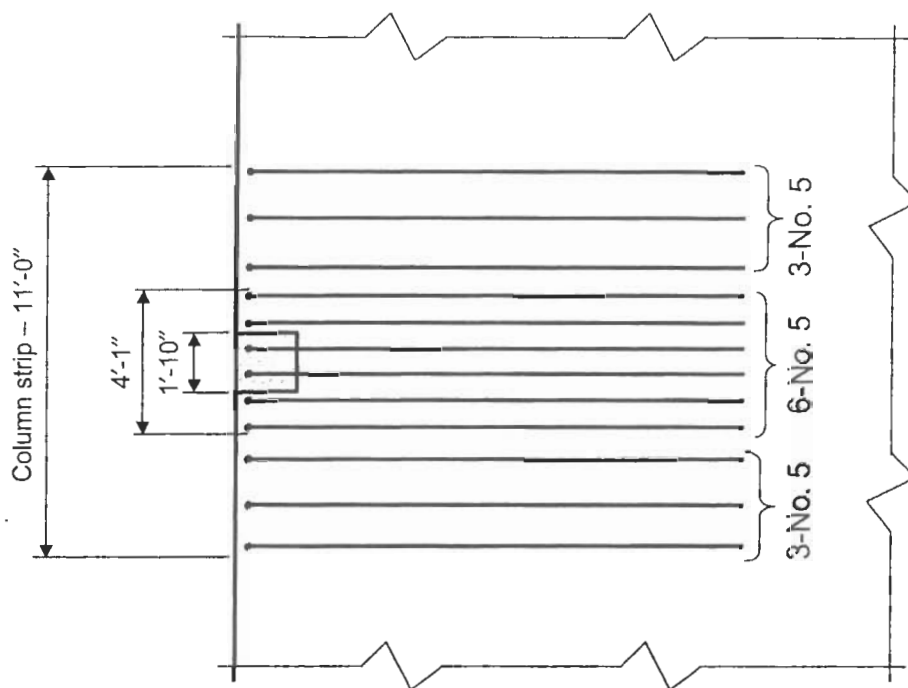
Reinforcement Detail at Exterior Column (SDC A)
